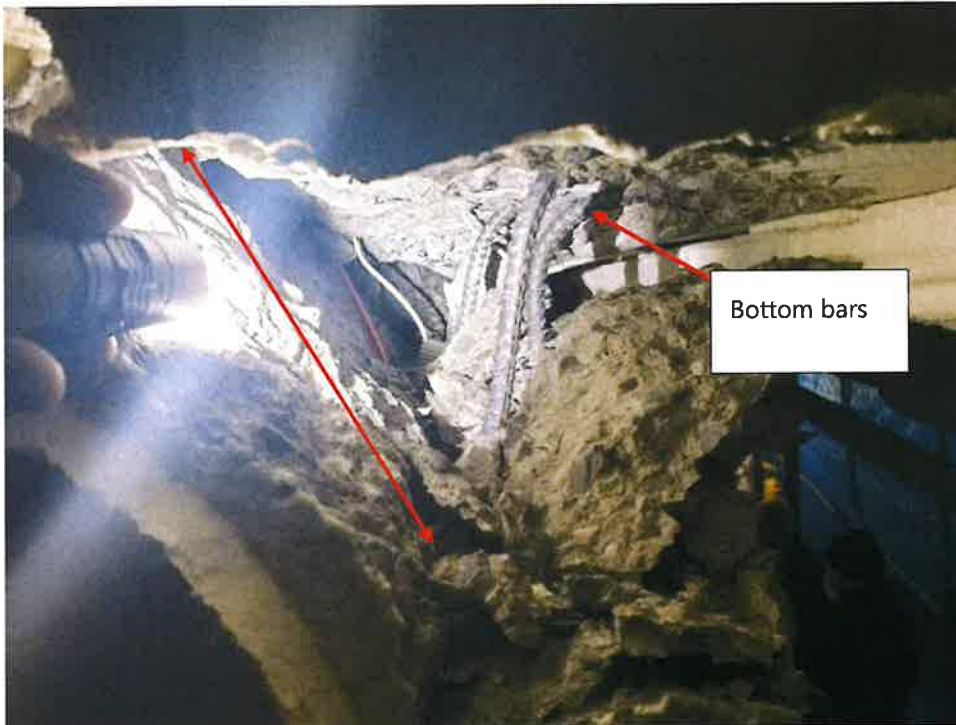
No Top Steel Crossing Failure Plane Looking North to South at West Failure Plane
